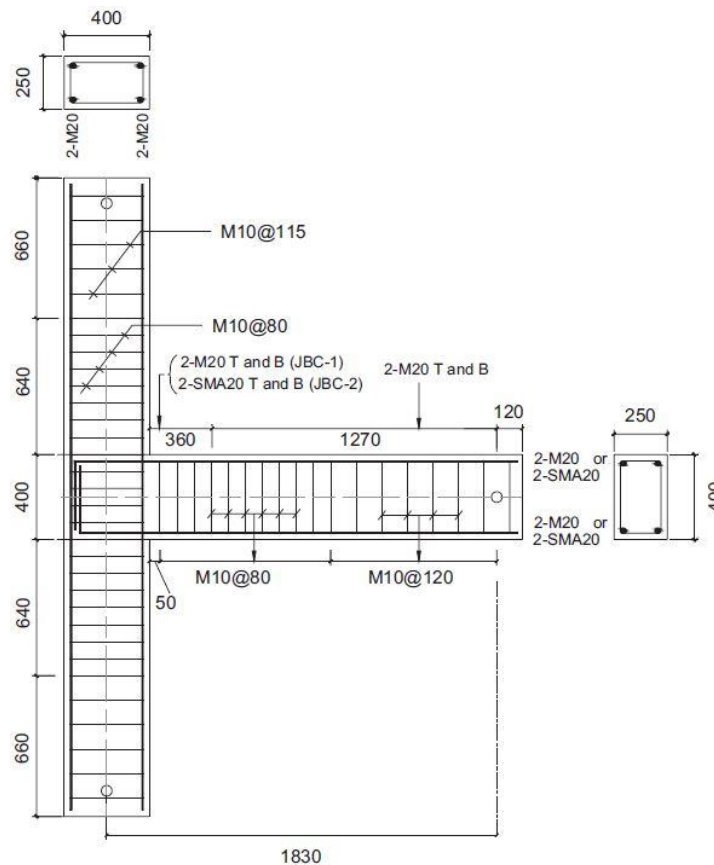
Details of BCJ-1 and BCJ-2, dimension in mm [78].
